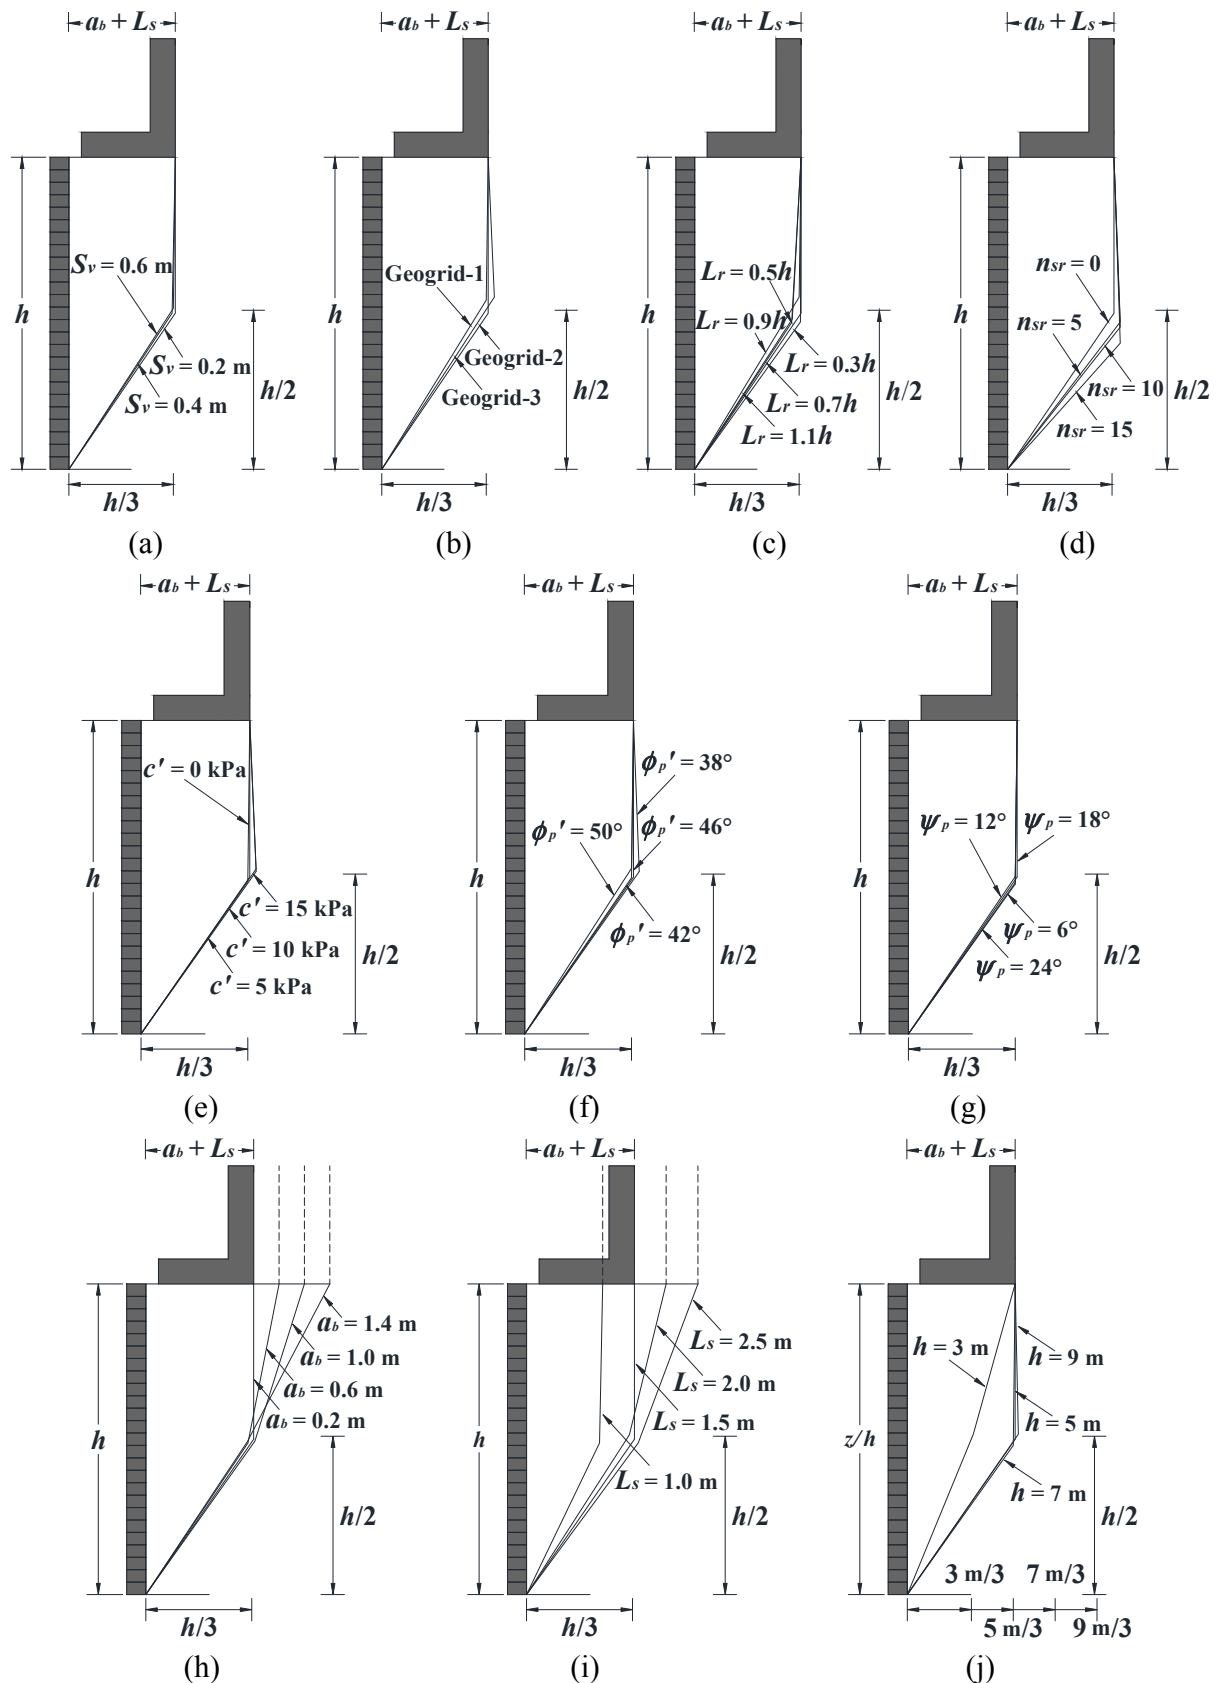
Bilinear failure surfaces for parametric study: (a) reinforcement spacing; (b) reinforcement stiffness; (c) reinforcement length; (d) secondary reinforcement; (e) backfill soil cohesion; (f) backfill soil friction angle; (g) backfill soil dilation angle; (h) bridge seat setback distance; (i) bridge seat length; (j) abutment height.
